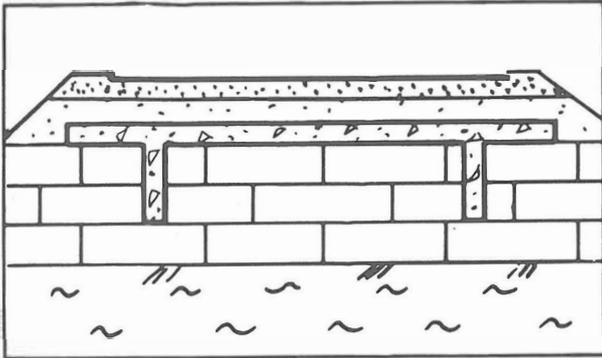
The EPS may provide "free" formwork for concrete beam structures interacting with the concrete slab.
